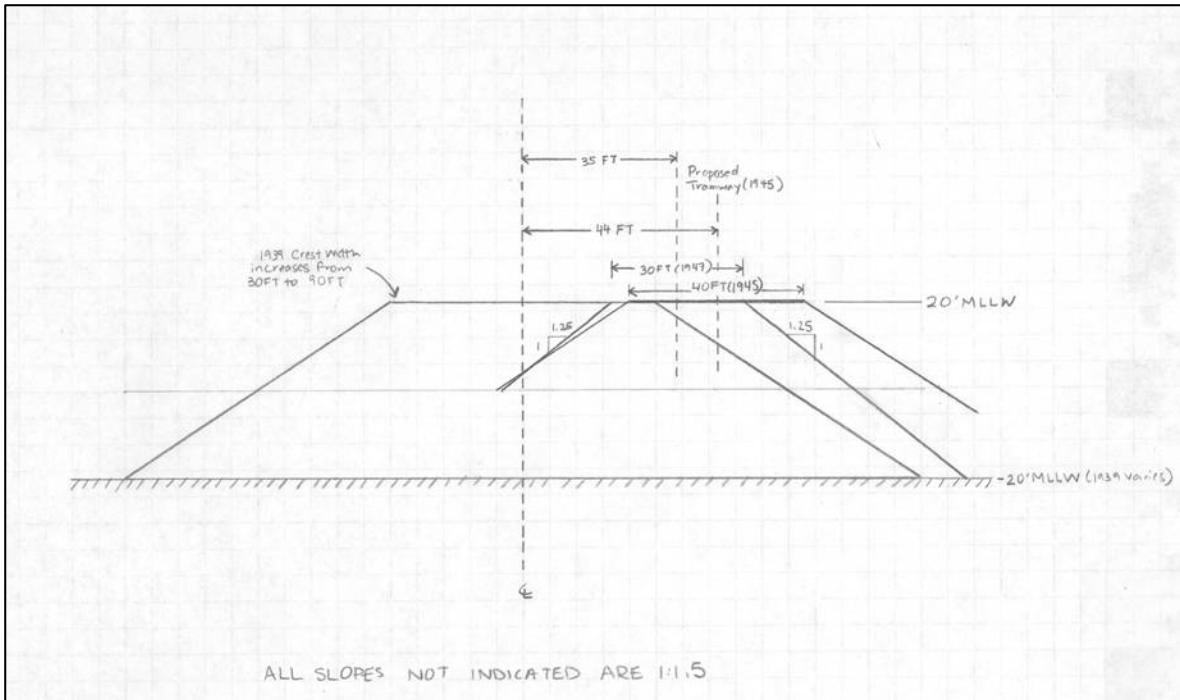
153. Jetty A Cross Section Templates - 94 to 96 – Trunk
